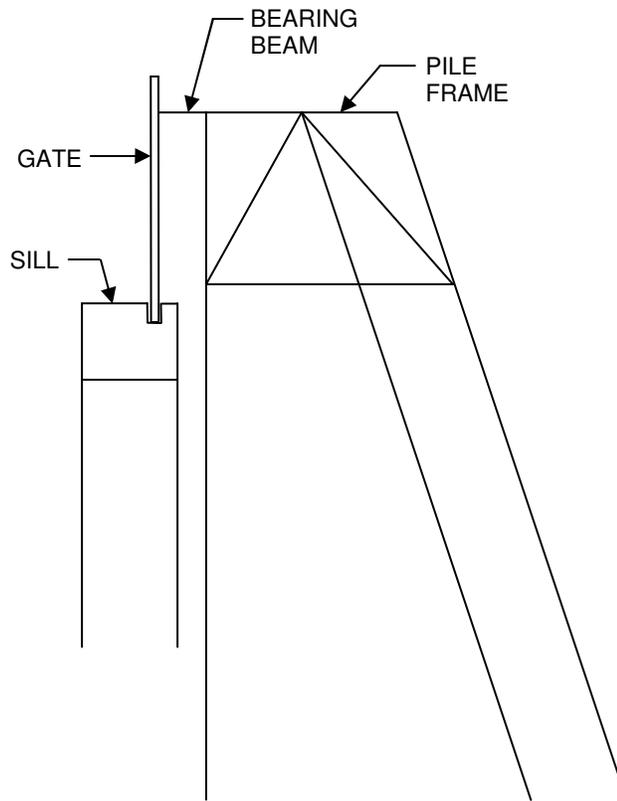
Schematic elevation of the London Avenue Canal and Orleans Avenue Canal Closure Structures gate and structure. 17th Street Canal Closure Structure is similar.
